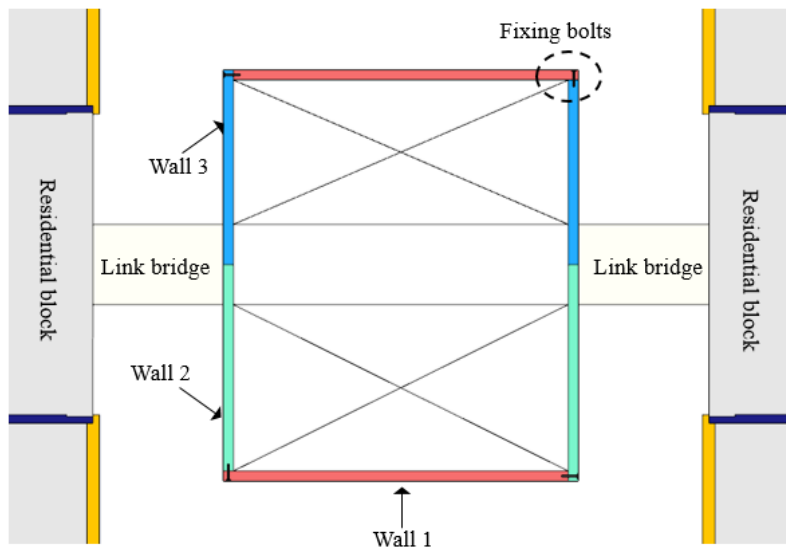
Lift/stair area comprised of three different wall panel types, which are bolted together at the corners
